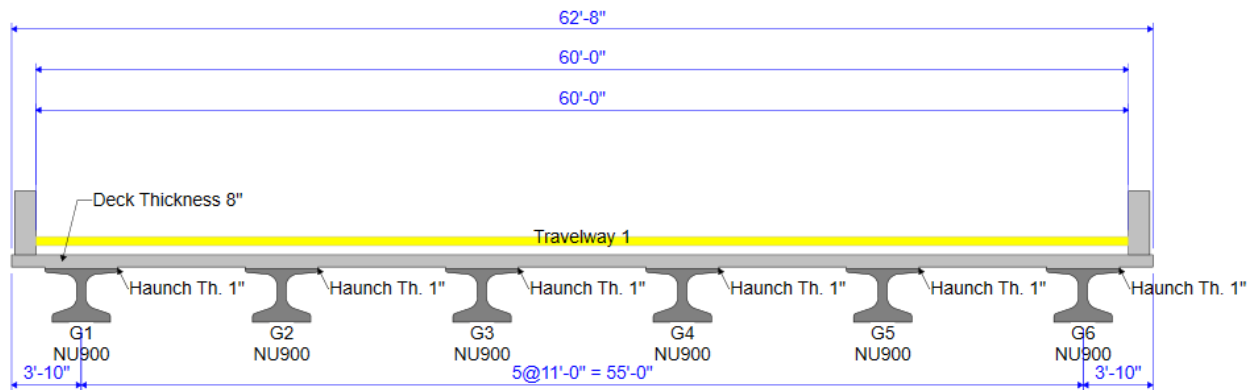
Bridge Cross Section for S080 41465 (AASHTOWare™ BrR, 2023)
